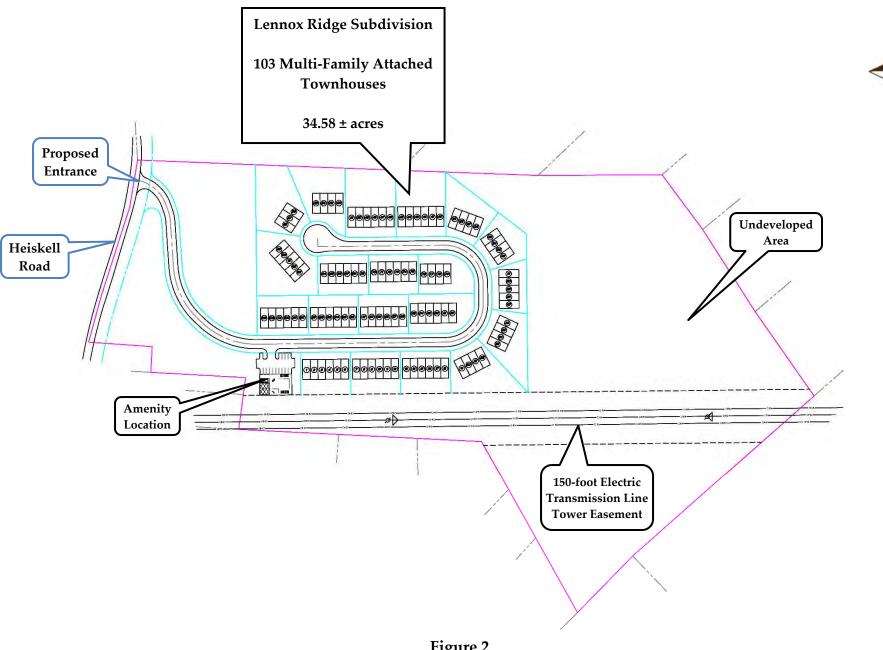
Preliminary Plan Layout Lennox Ridge Subdivision
